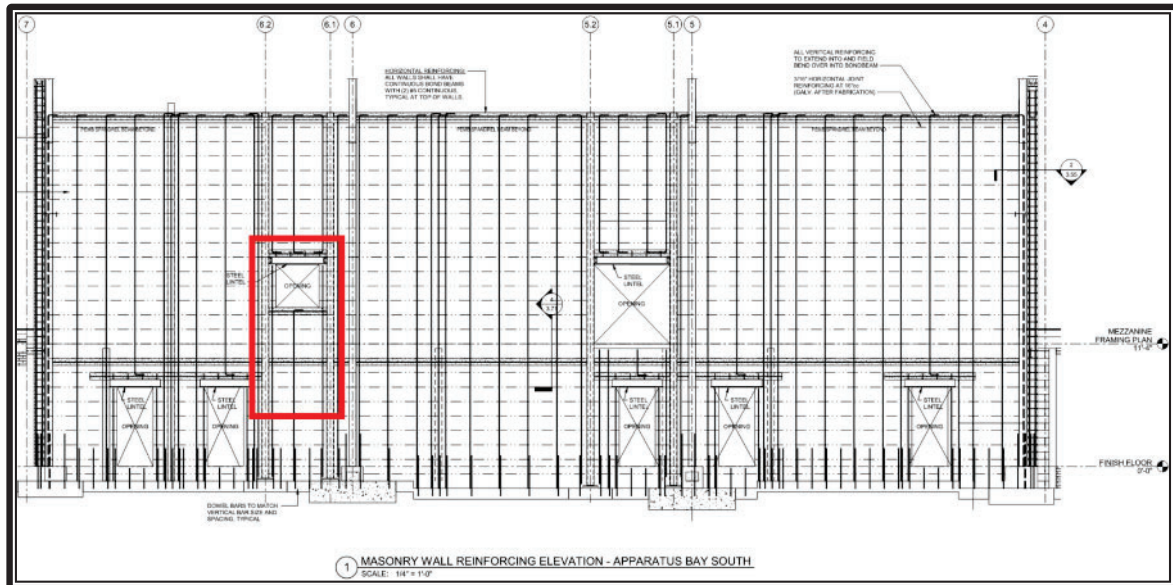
CMU wall elevation showing the approximate location of Test Area 2 (outlined) (cropped plan courtesy of T&V).
